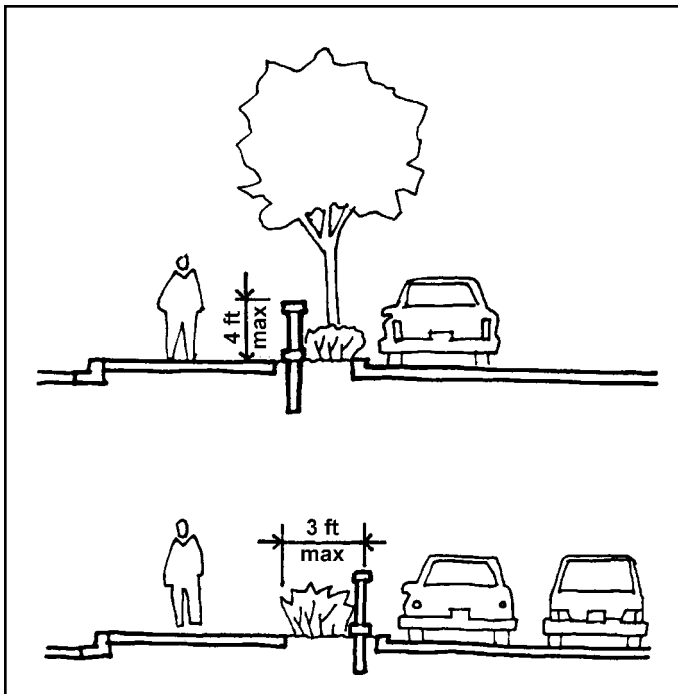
Alternative ways of screening parking lots which are located adjacent to sidewalks.
